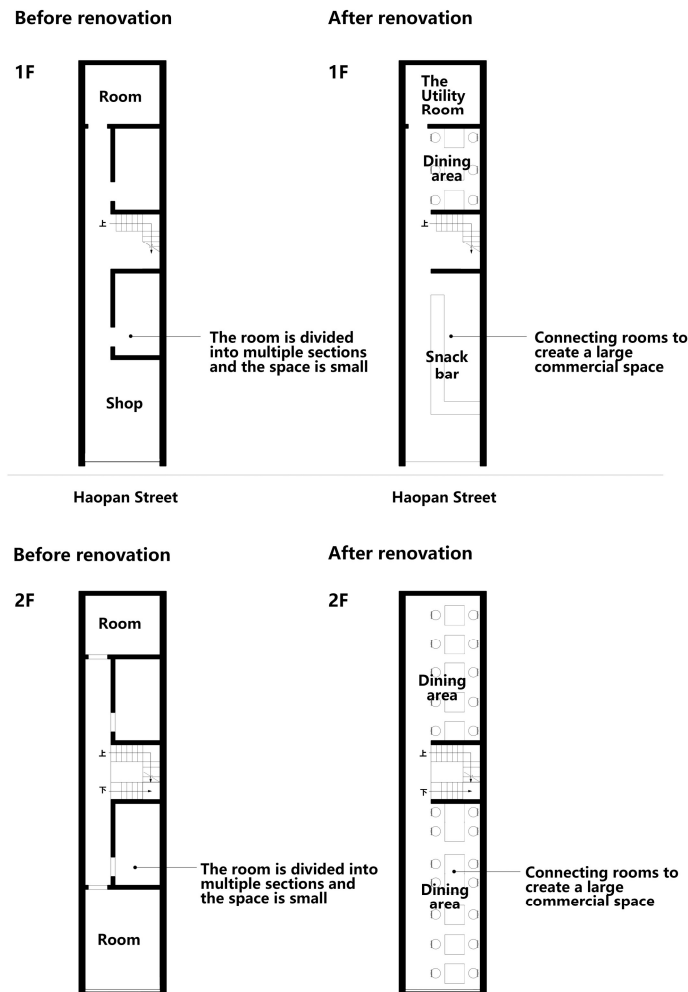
Street Node 1 Residential Building at No. 55 Haopan Street Pre - and Post Renovation Plan
